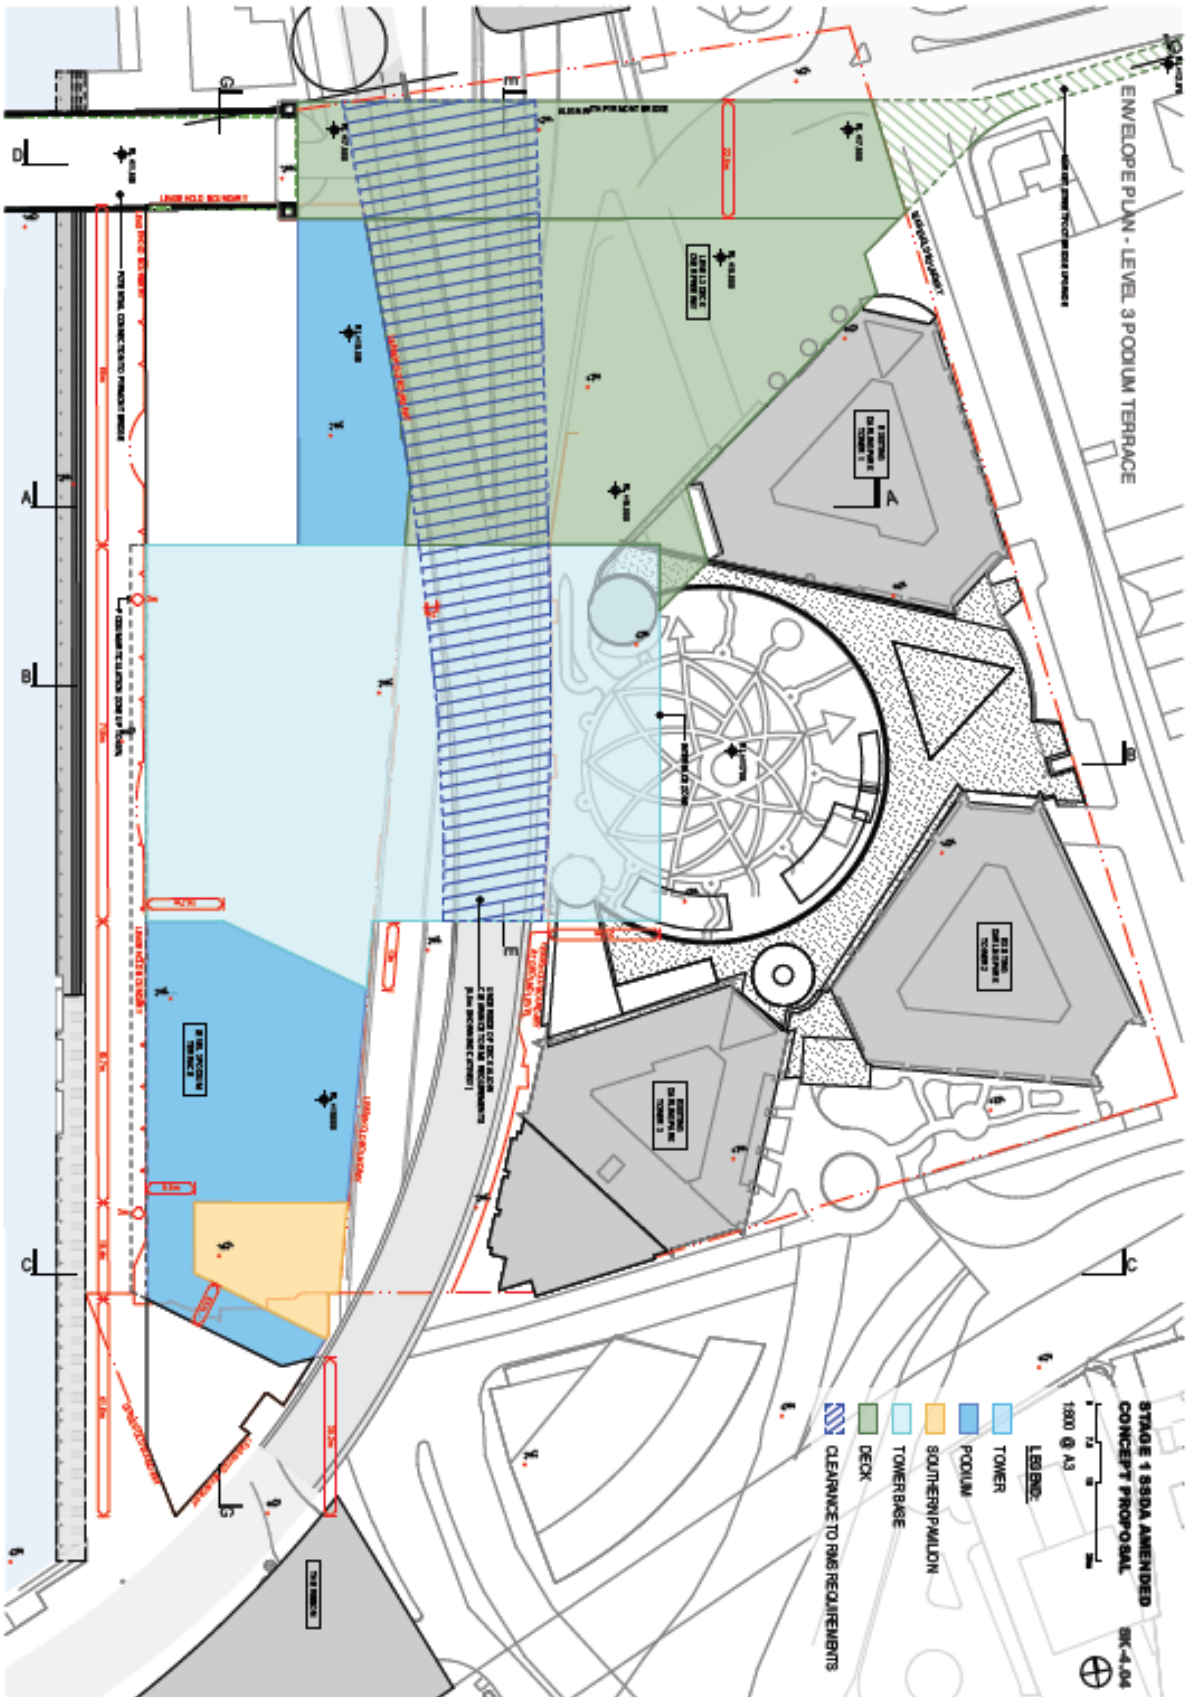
Proposed site layout at third floor level. (Source: FJMT, dwg SK-4.04, received 15/08/2017)
